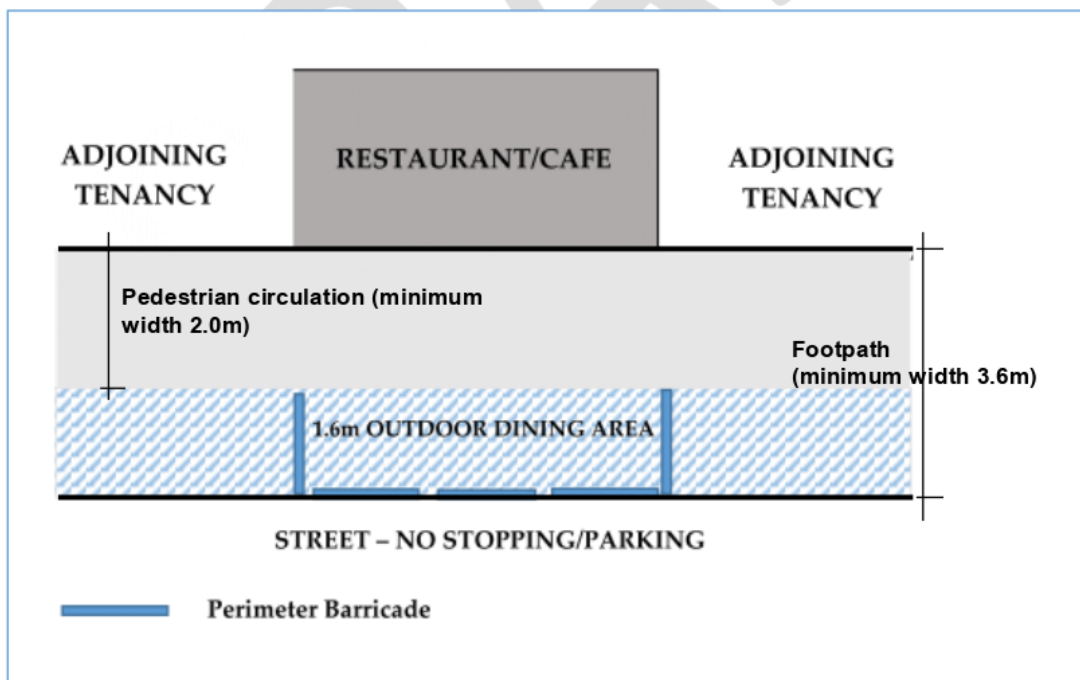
Minimum dimensions for outdoor dining on primary retail streets not adjoining car parking.
